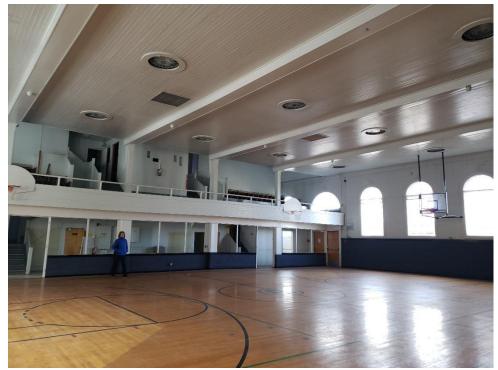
Typical interior view of the vacant gym building on Parcel A.
